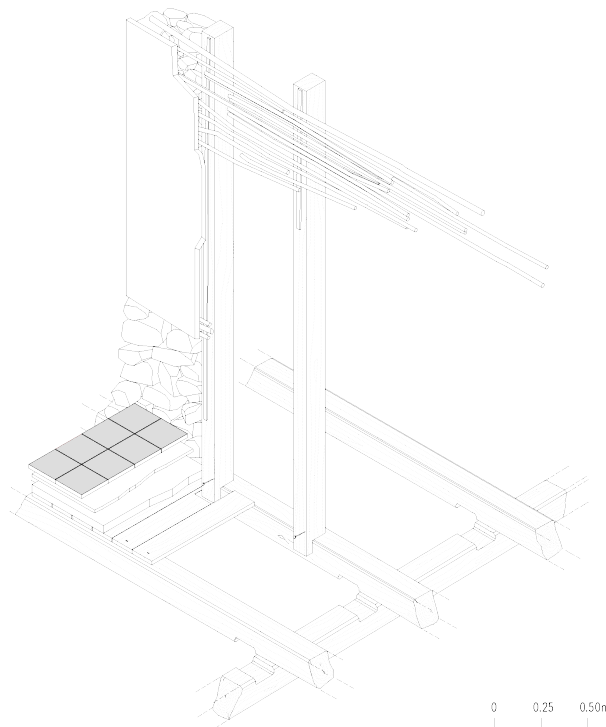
Internal half-timbered wall: Bishop's Palace in Mileto (Calabria region)(by author).
